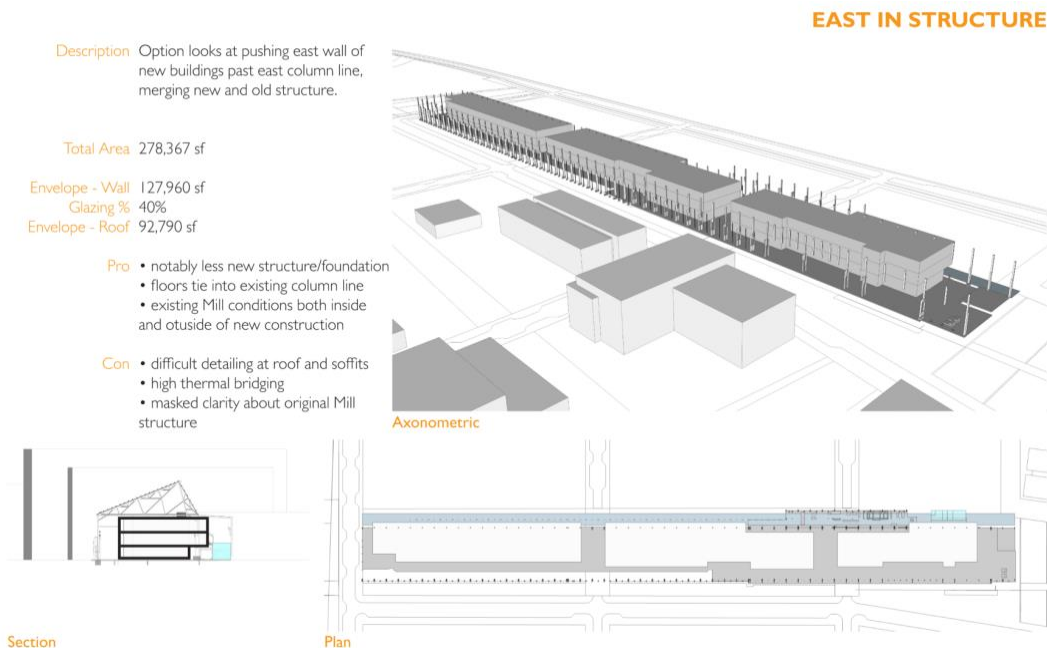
Image showing initial building design intent to integrate the old and new buildings.
